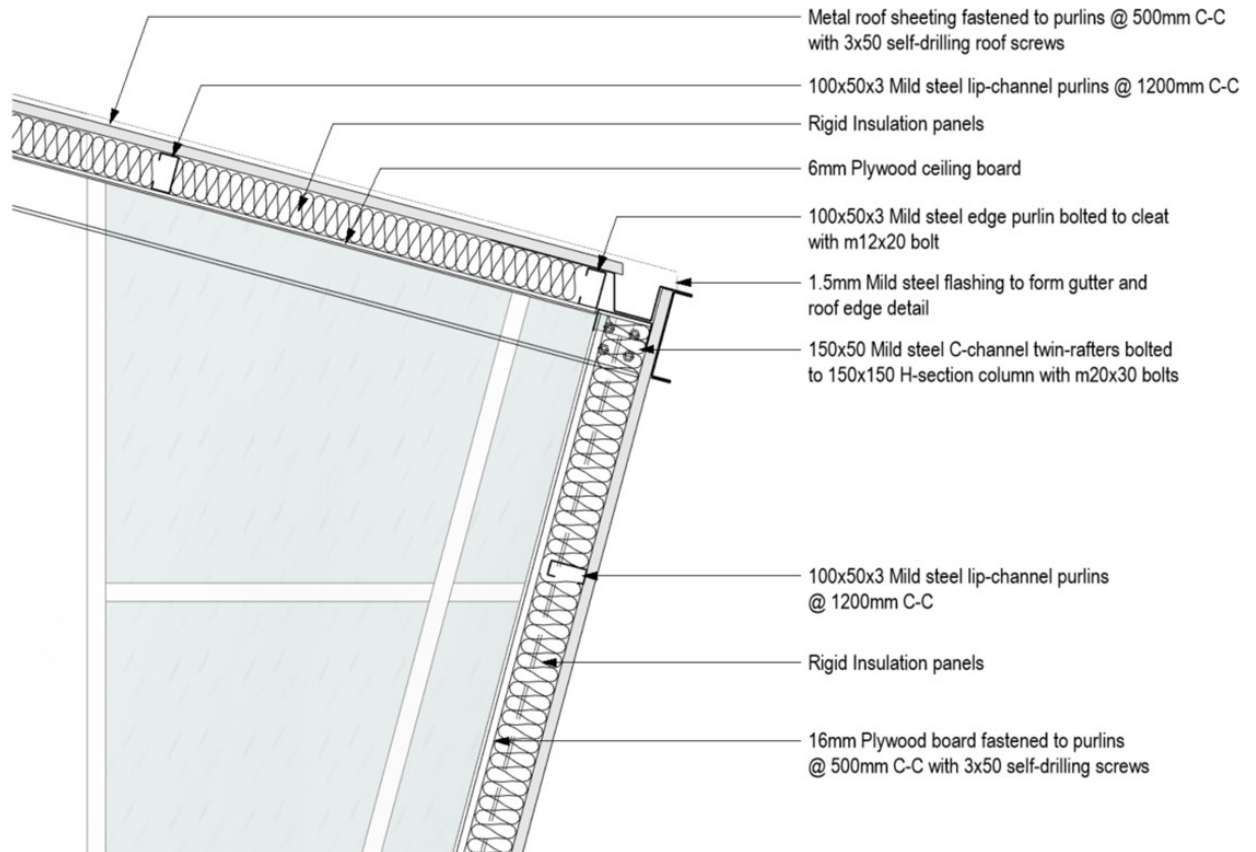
Detail 1: Roof to wall articulation (Author 2020)
